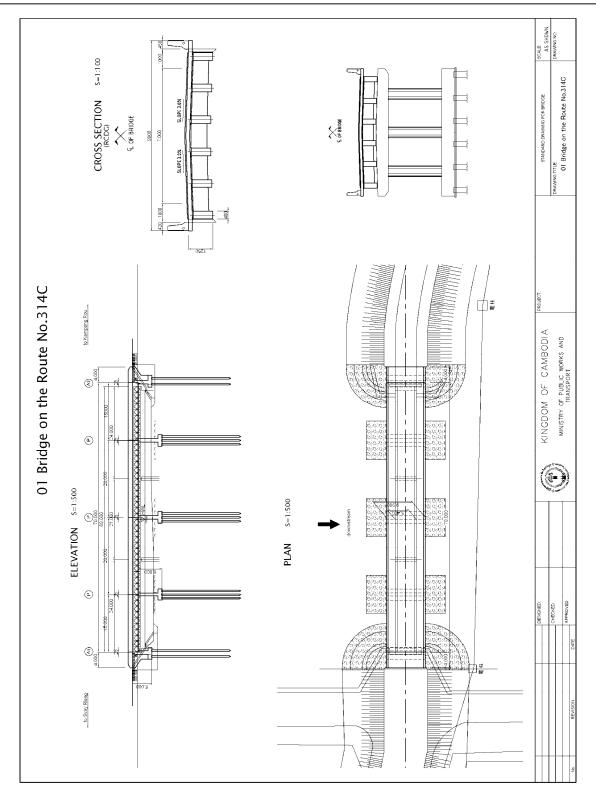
Plan of No1 Bridge on the Route No. 314C
